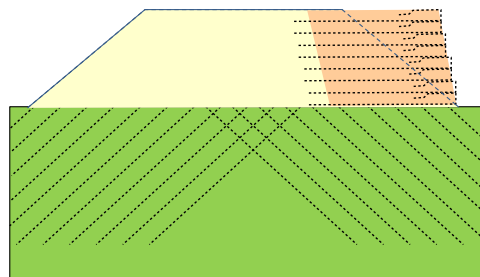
Diagonal drains: reinforcement sub grade and acceleration of drainage
